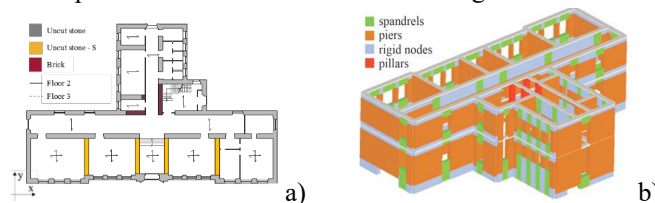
a) in plan view and b) 3D equivalent frame model of the selected case study.
